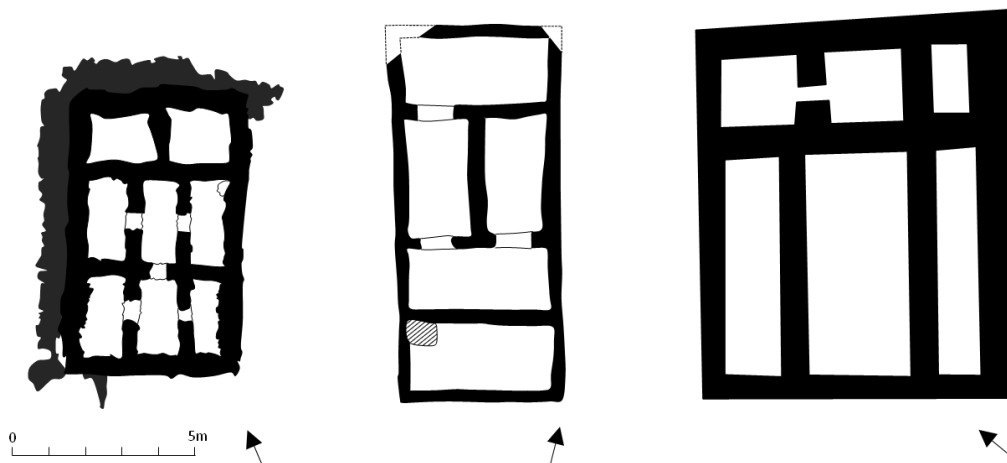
Floor plans of typical multi-roomed buildings from the Northern Levant. From left to right, Çayönü (Building CA), Abu Hureyra 2 (Phase 5 house) and Bouqras (Building 11). Redrawn after Schirmer 1990, fig.9; Moore *et al.* 2000, fig.8.51; Akkermans *et al.* 1981, fig.7.
